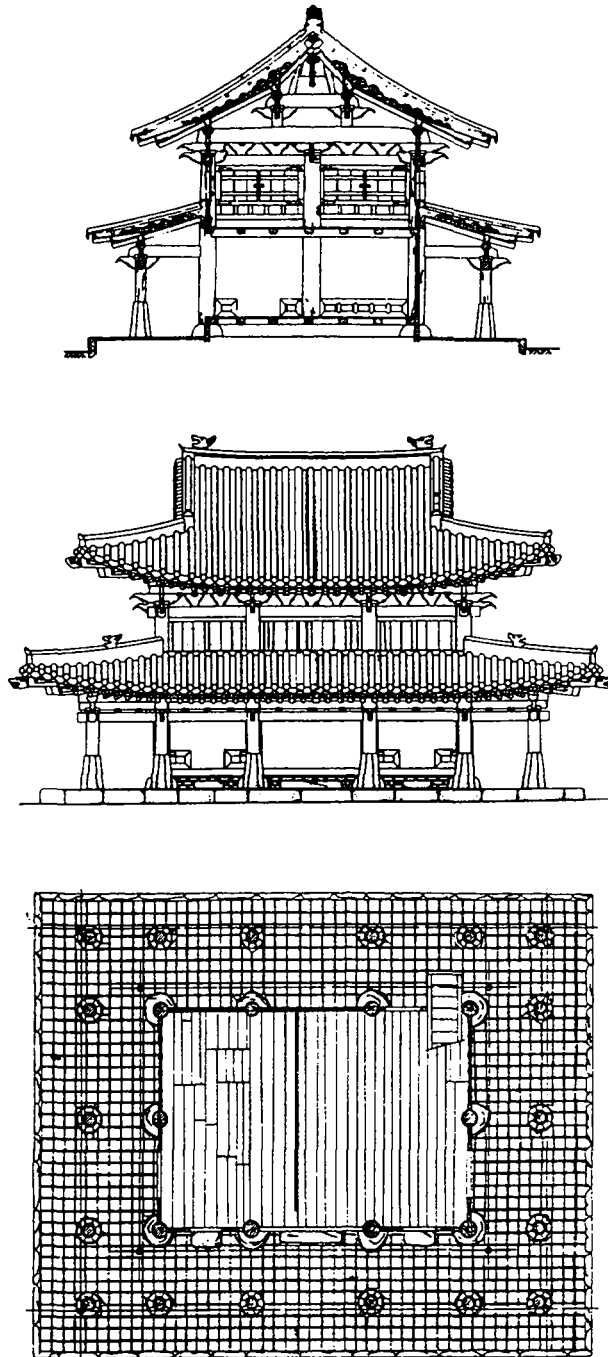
Ground plan, front elevation and transversal section of the Su-ŏ-chang-dæ
